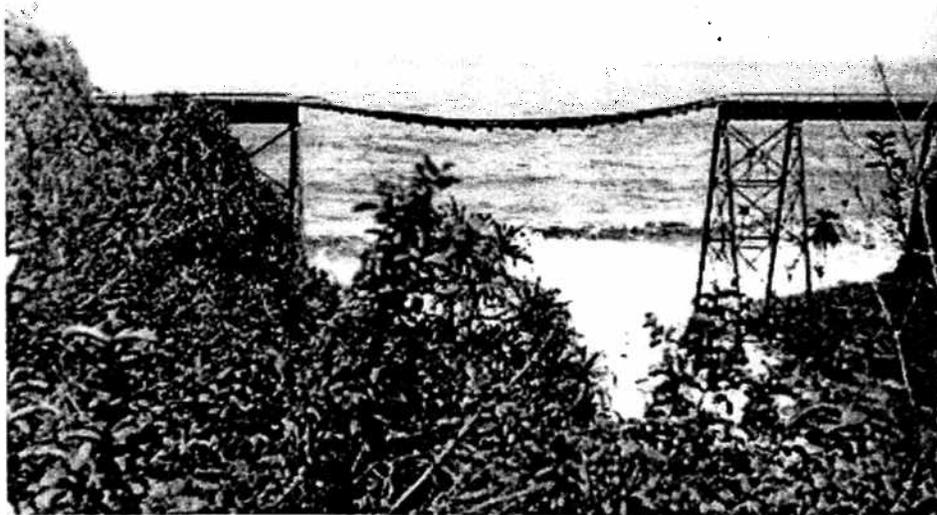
View of Kolekole Bridge after 1946 *tsunami*, center support washed out. (Pacific Tsunami Museum Archives-Henrietta Carvalho Collection).
